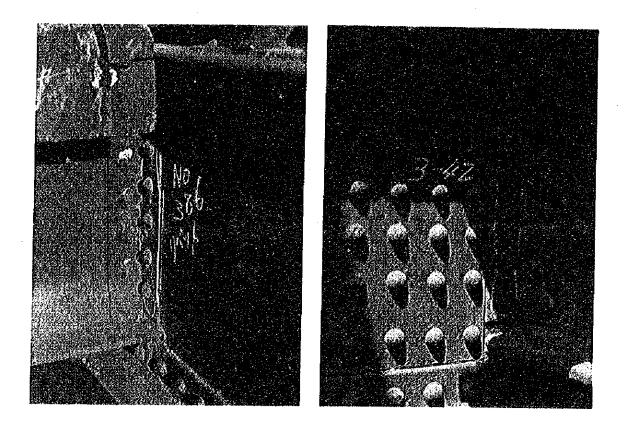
Loose Rivets for Connection of Stringer with Floor Beam
